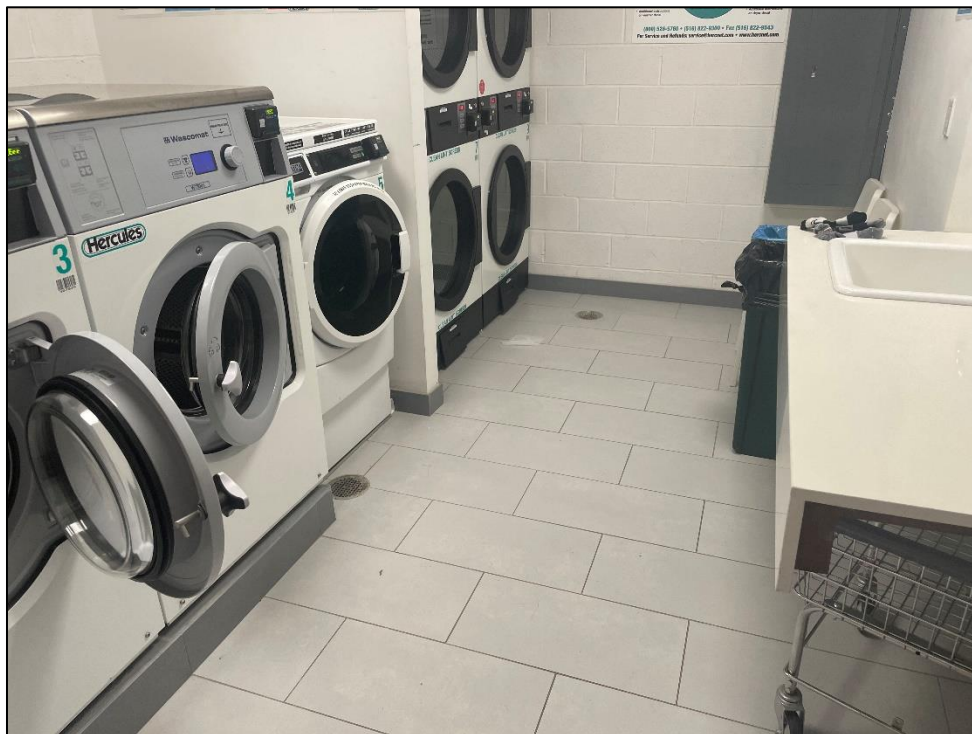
, 05/17/2023: View of composite cover in laundry room (facing southwest).
